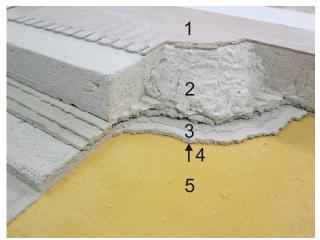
Example of an internal wall insulation system with each layer exposed. In order, these layers are: 1) plaster; 2) internal wall insulation; 3) reversible plaster; 4) CDD (not visible); 5) 'original' paint layer (in this case, a mock-up using typical historic pigments and binders). Photo: Fraunhofer IBP.
